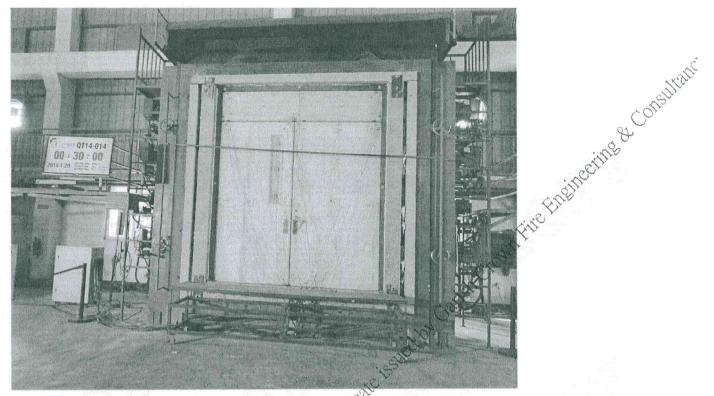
Unexposed surface of the specimen just after the commencement of test.
